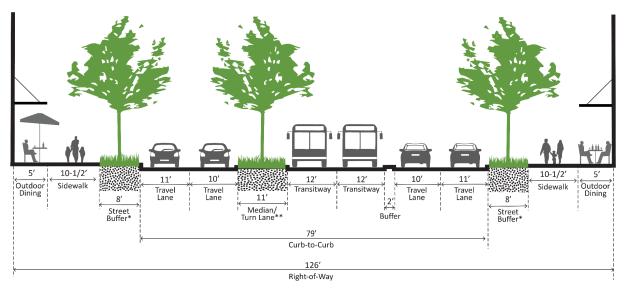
Georgia Avenue (M-8): Blair Mill Road to Eastern Avenue, Looking North
